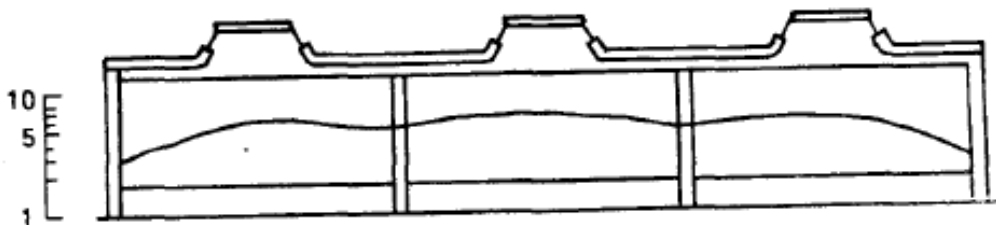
MONITOR ROOF WITH 60° SLOPE GLAZING
